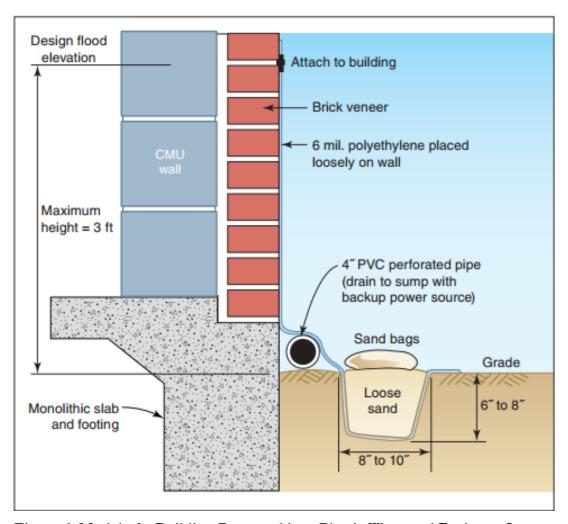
Model of a Building Protected by a Plastic Wrap and Drainage System
